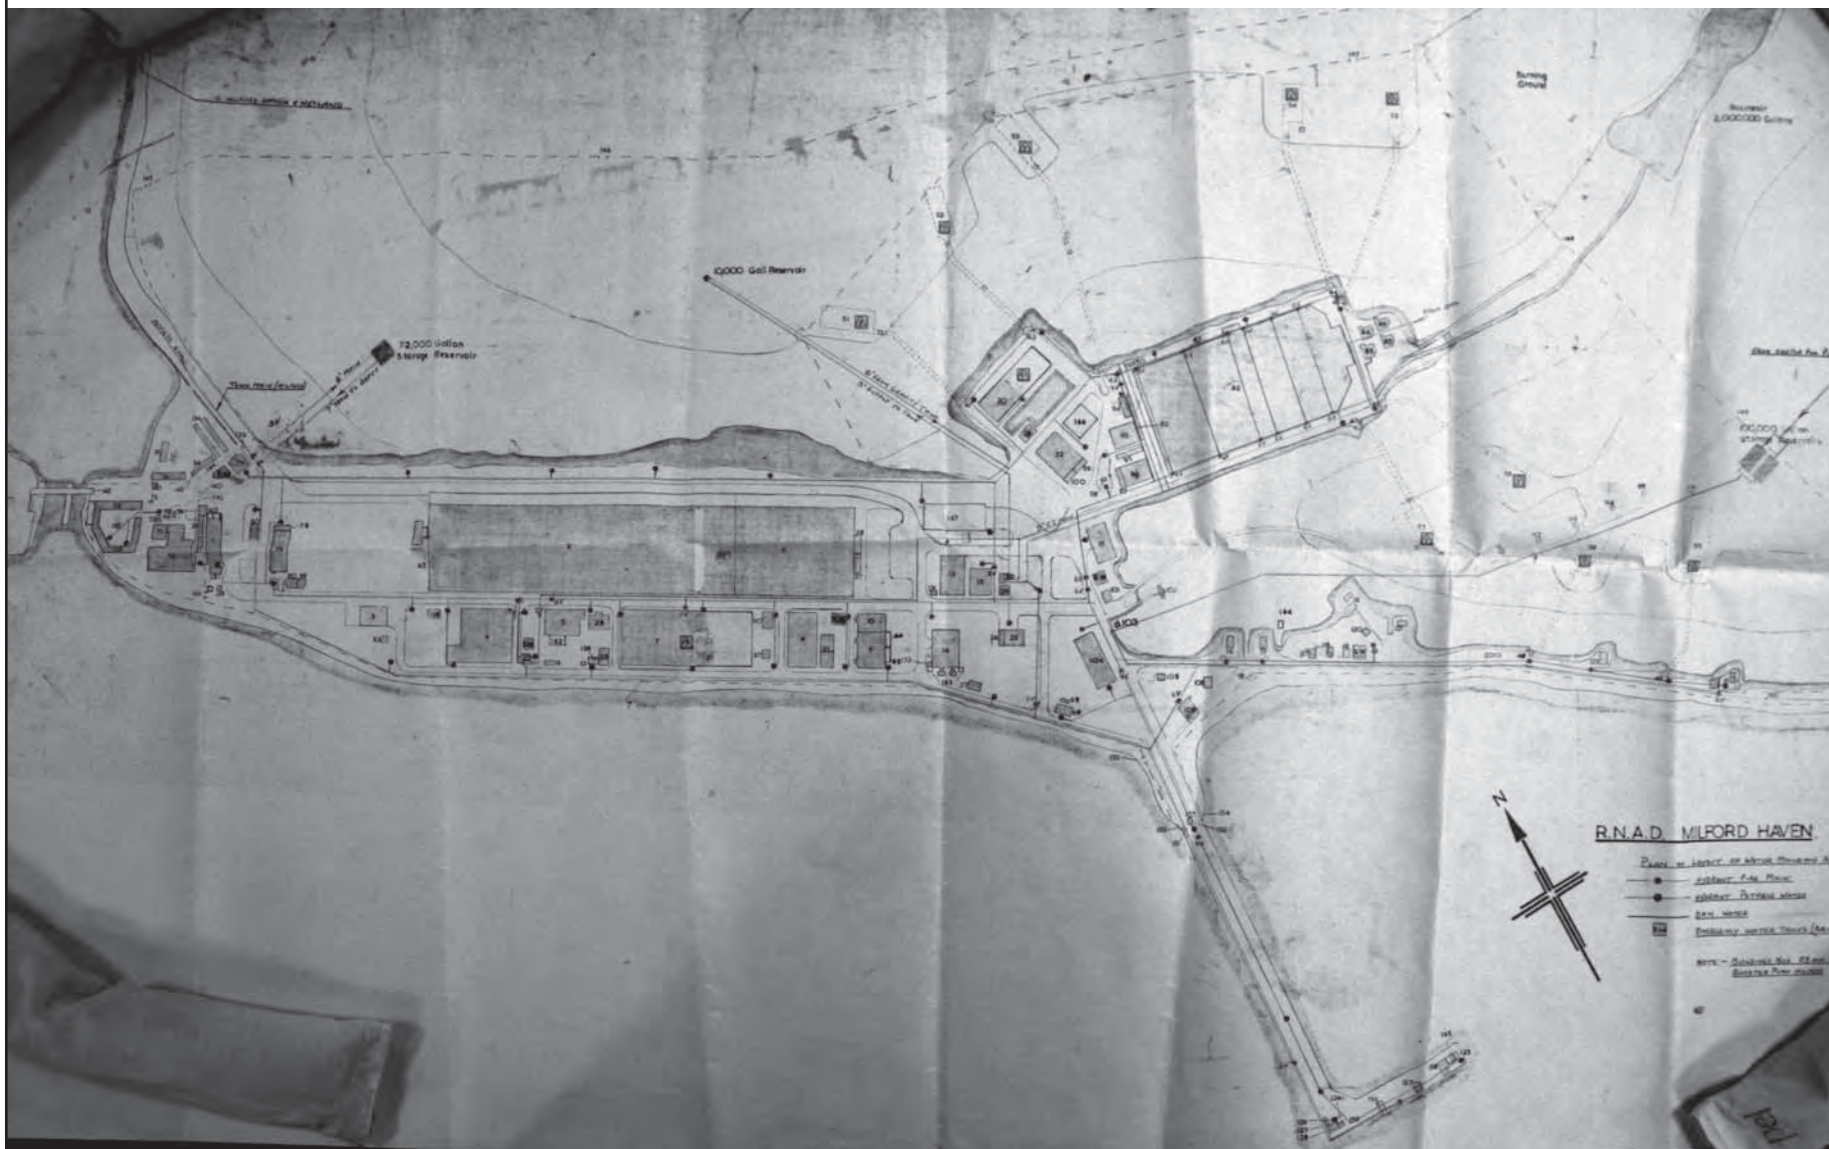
Water mains plan, c.1960, showing the layout of the RNAD site at Blackbridge. Pembrokeshire Record Office - PCC/FI/4/5.
